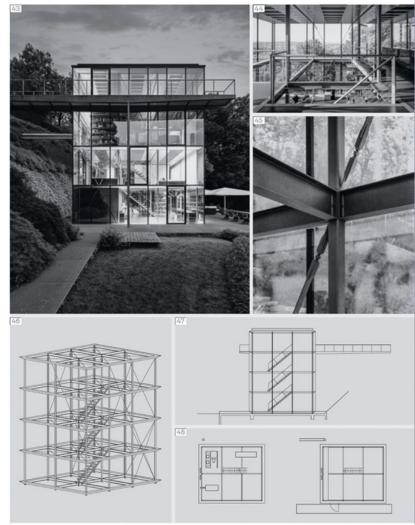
FROM LEFT TO RIGHT: EXTERNAL VIEW; THE OPEN INTERIOR, THE SPACES OF WHICH HAVE NO PARTITION WALLS AND ARE SEPARATED ONLY BY GLASS. CONNECTING JOINTS IN THE PRIMARY STRUCTURE. STRUCTURAL AXONOMETRY. LONGITUDINAL SECTION AND PLANS OF FIRST FLOOR AND TOP FLOOR. ©ROLAND HALBE, ©WERNER SOEBEK
